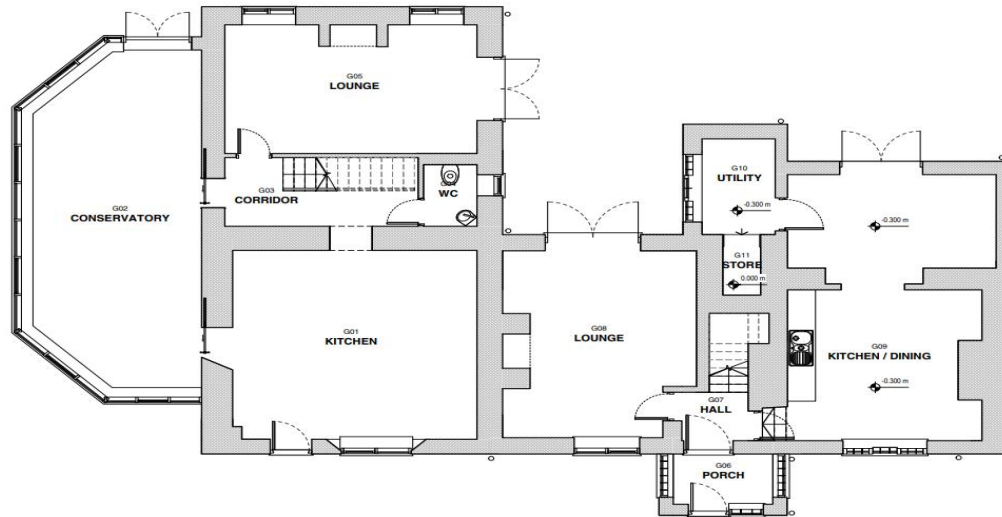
Showing current ground floor of dwelling with extensions (not to scale).
